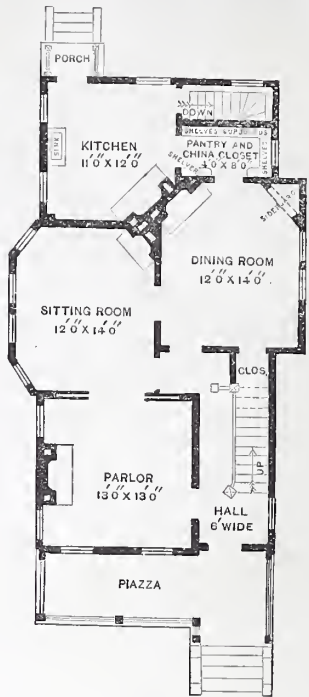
First Floor Plan.—Scale, 1/16 Inch to the Foot.
